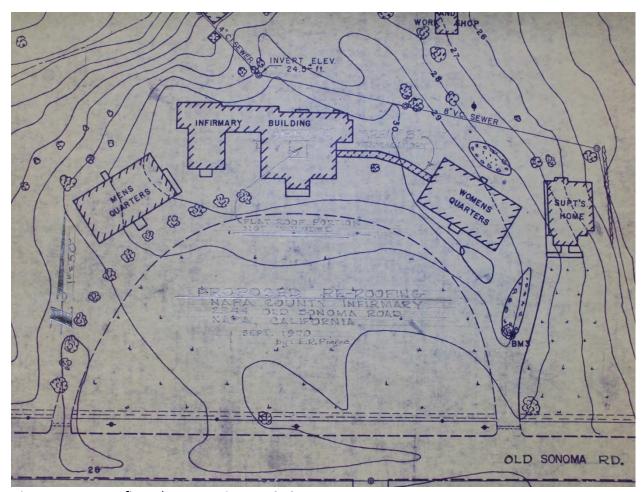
Re-roofing plan, E.R. Pierce, 1970.
